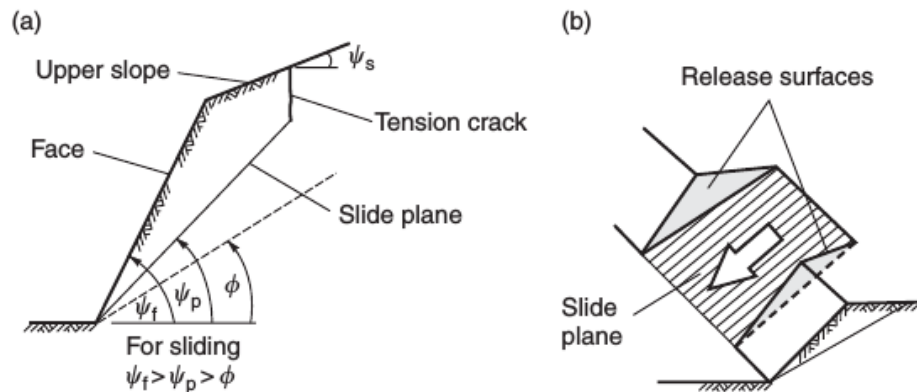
Geometry of slope exhibiting plane failure: (a) cross-section showing planes forming a plane failure and (b) release surfaces at ends of plane failure. ([Wyllie and Mah, 2004](#))
